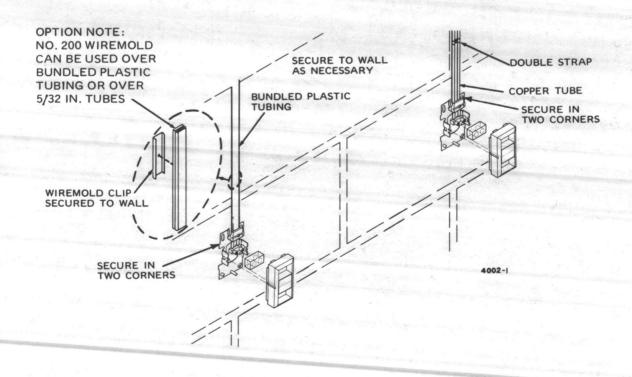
Mounting Shallow Wall Box Without Plaster Ring on Plastered Block, Concrete, or Tile Walls.
